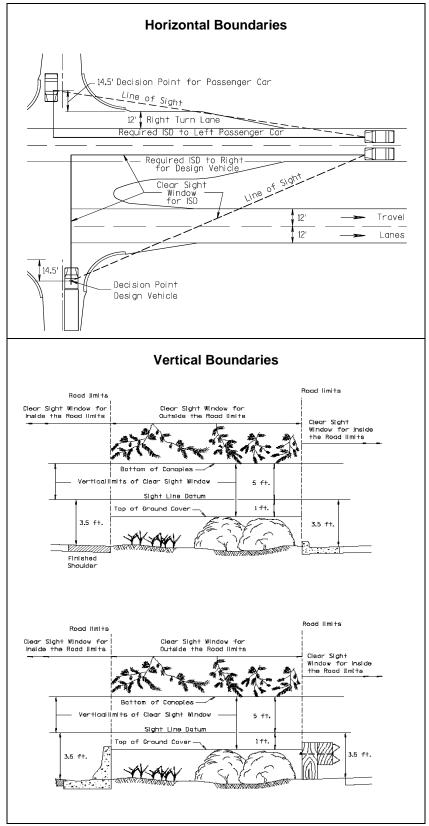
Clear Sight Window (adapted from Florida DOT¹⁷)
